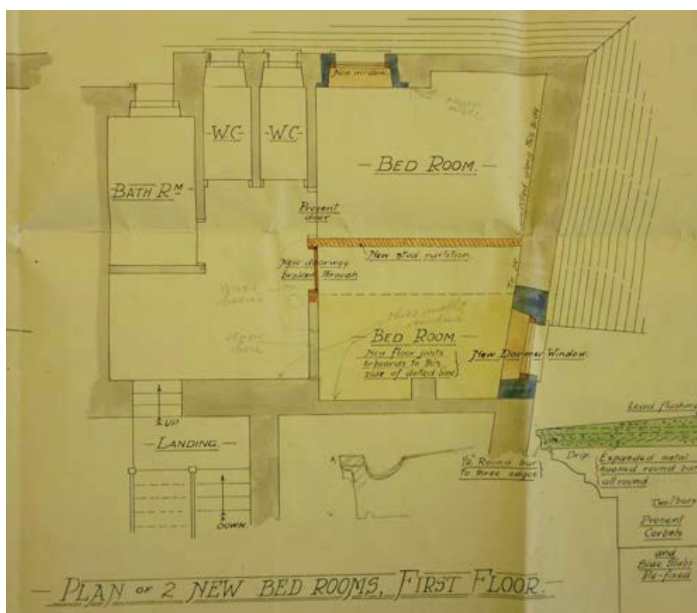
(left): Proposed first floor plan, 1929 (CAC(B) Z/919/1 1909-1946)
